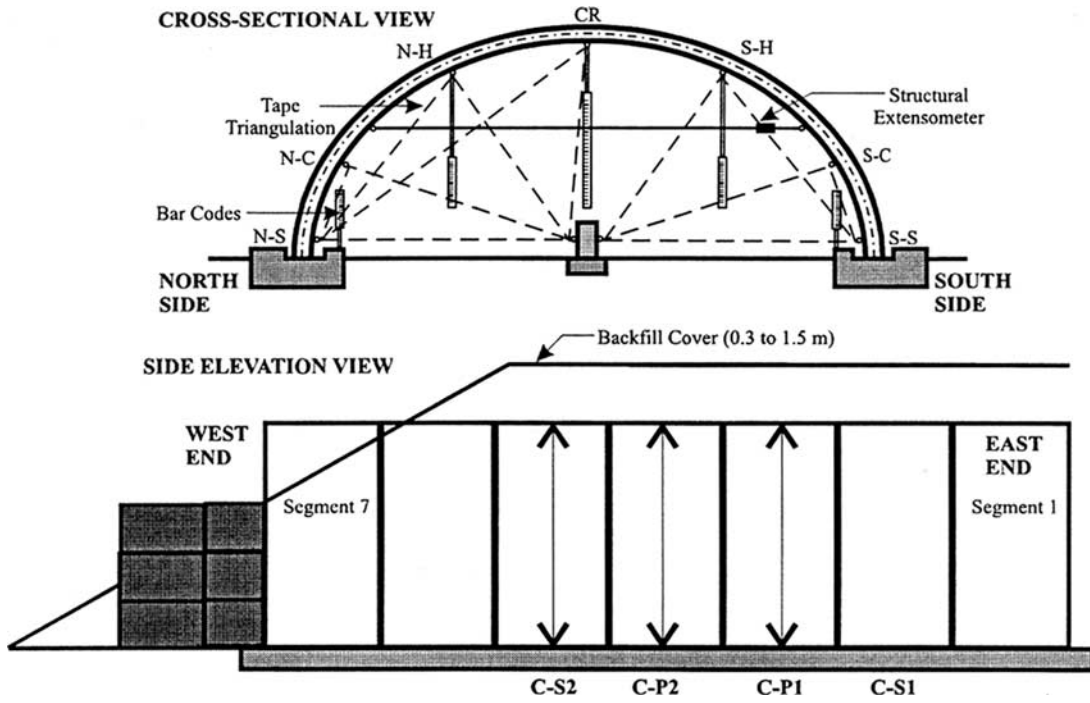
Instrumentation for monitoring deformation in concrete culvert.
